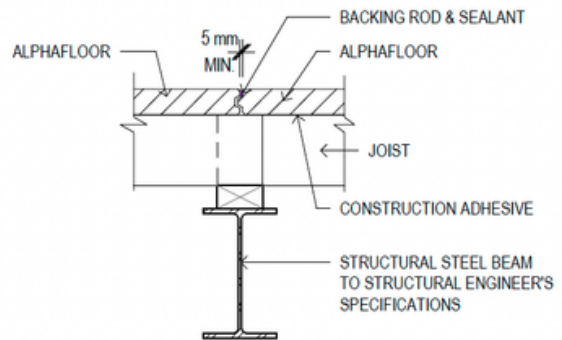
ALPHAFLOOR® FIXING AT ALTERNATIVE END OF PANELS TO TIMBER JOISTS
